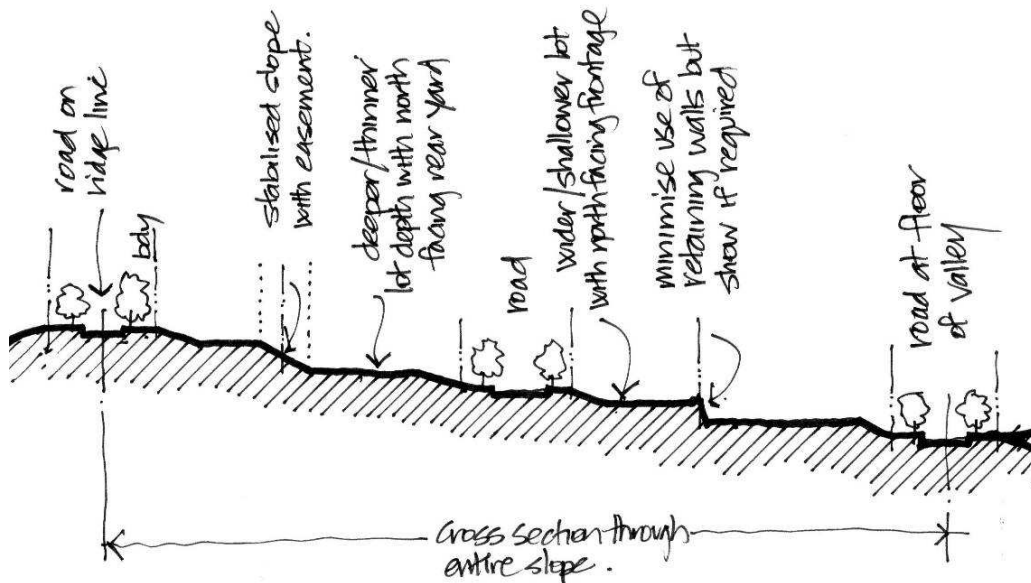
Cross Section from ridge to floor of valley showing proposed roads and earthworks at boundaries.
